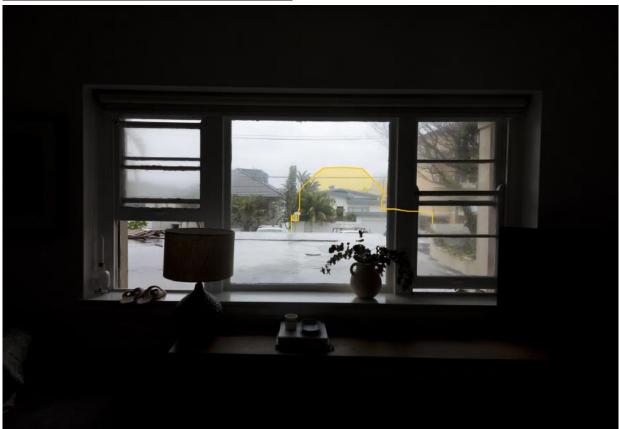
View from ground floor level unit showing the outline of the proposed built form
